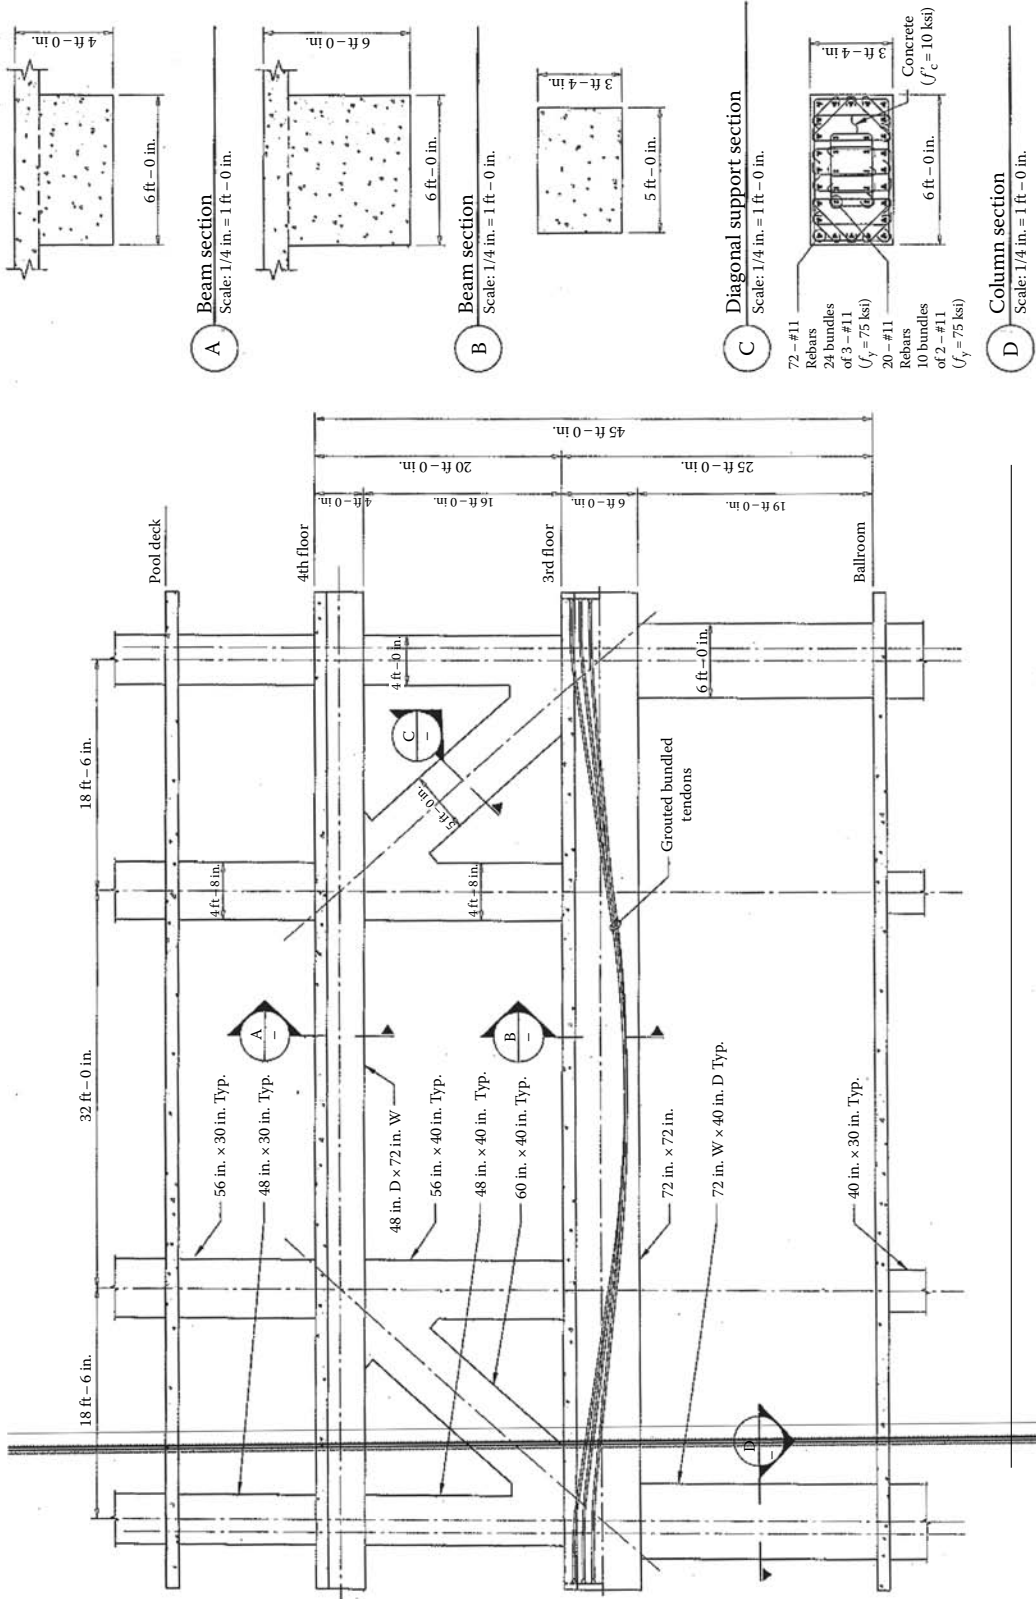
Transfer girder: schematic elevation with concrete column.
